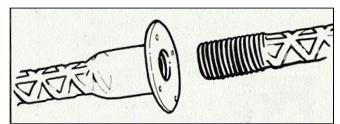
Integral threaded splice system achieves a doweled splice at construction joints with only one connection. It is manufactured from two pieces of rebar, one forged with a barrel tapped with standard coarse threads and finished with an integral flange. The end of the adjoining piece of dowel is enlarged to match by upset forging and roll threading.
